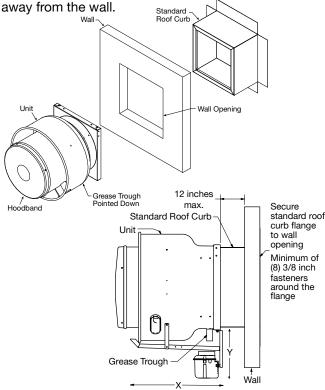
Typical Sidewall Mounting Installation (Through Wall)
